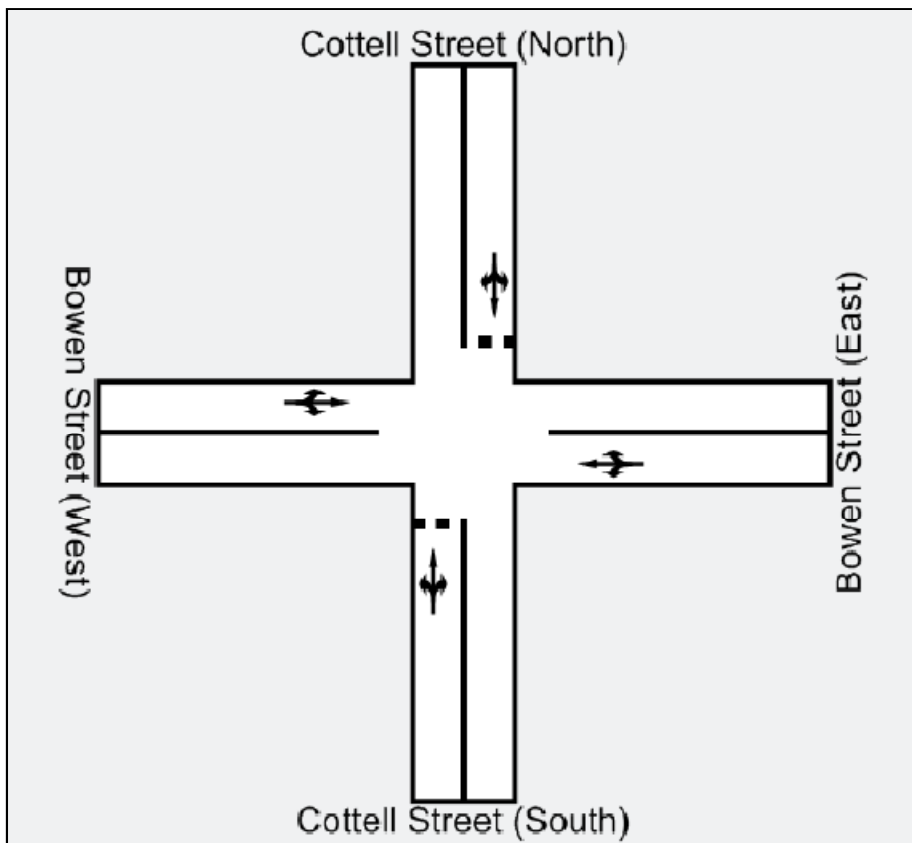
Existing Configuration of the Bowen Street/Cottell Street Intersection
